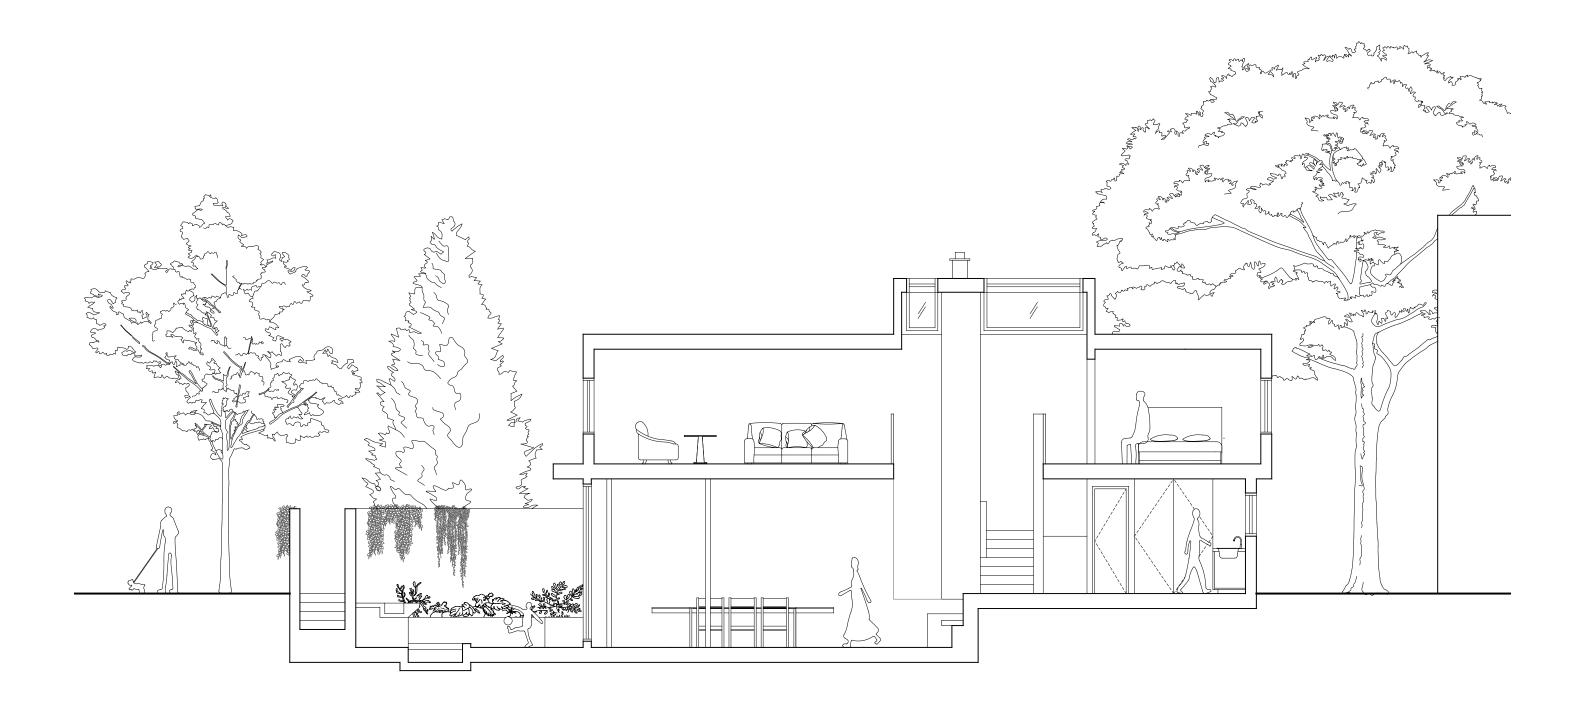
| Shim-Sutcliffe North - South Section 1:75
